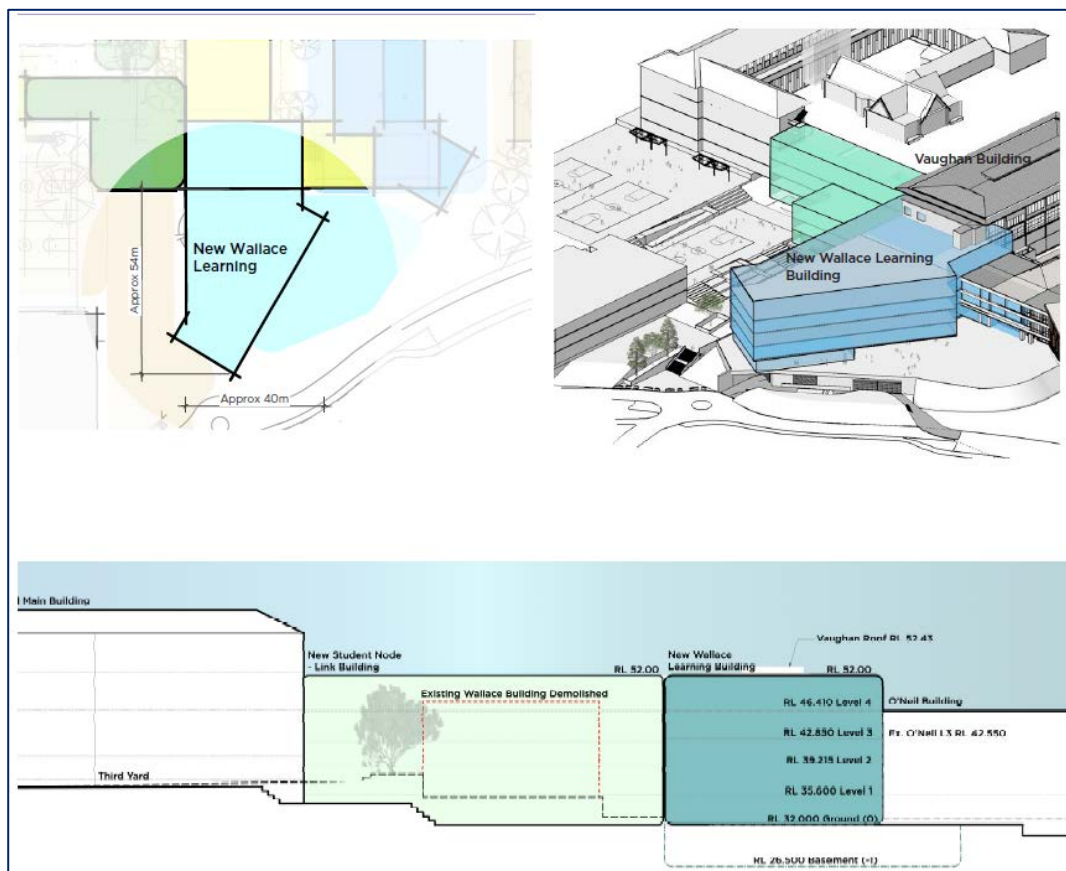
| Cross-section and building mass of new Wallace Building (Source: Amended Modification Report 4 August 2020)
